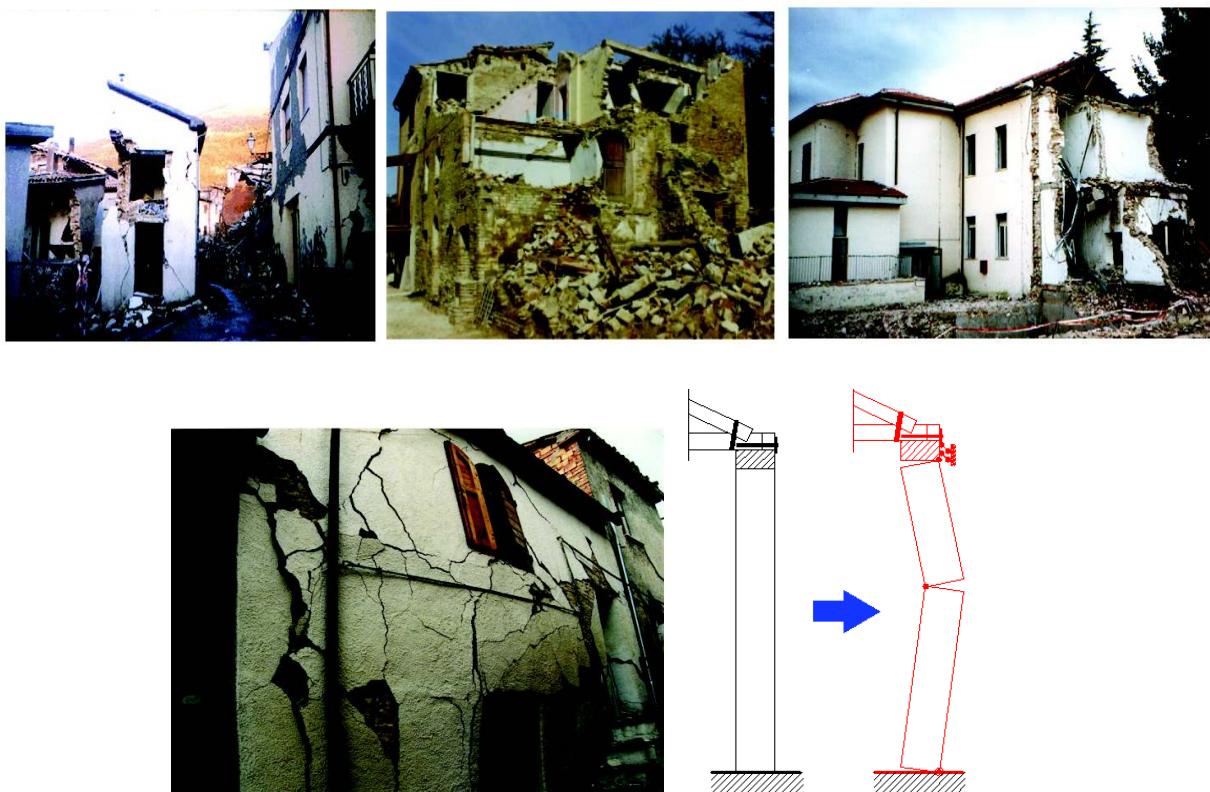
In this masonry building it is possible to see a flexural wall failure. There is a good roof-to-wall connection but the middle floor is not connected to the wall.
